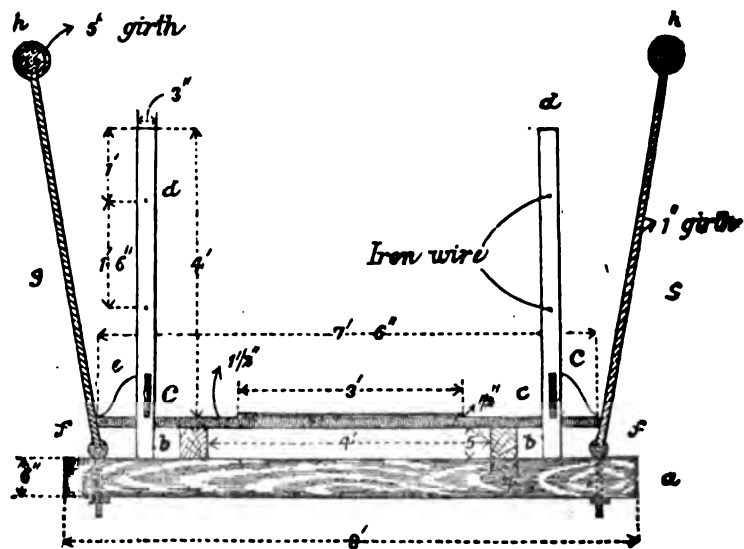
is a cross section of the Thadidr suspension bridge. *a* is a cross-piece in elevation; *b, b* the longitudinal beams in section; *c, c* the planks which form the roadway; *d, d* the railing; *e, e* the struts which strengthen the uprights of the railing; *f, f* the eye bolts to which the suspenders *g, g* are fastened; *h, h* the main longitudinal ropes in section. (Scale = $\frac{1}{2}$.)
